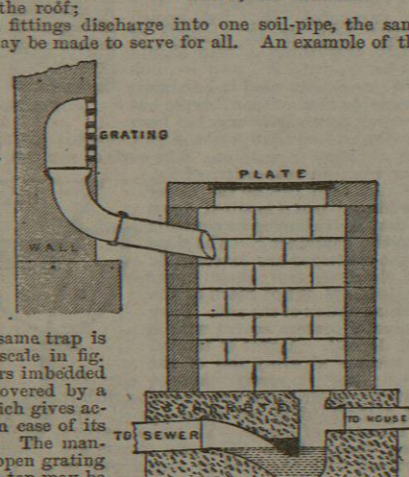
Buchan Trap and Manhole, with ventilating grating in wall.
